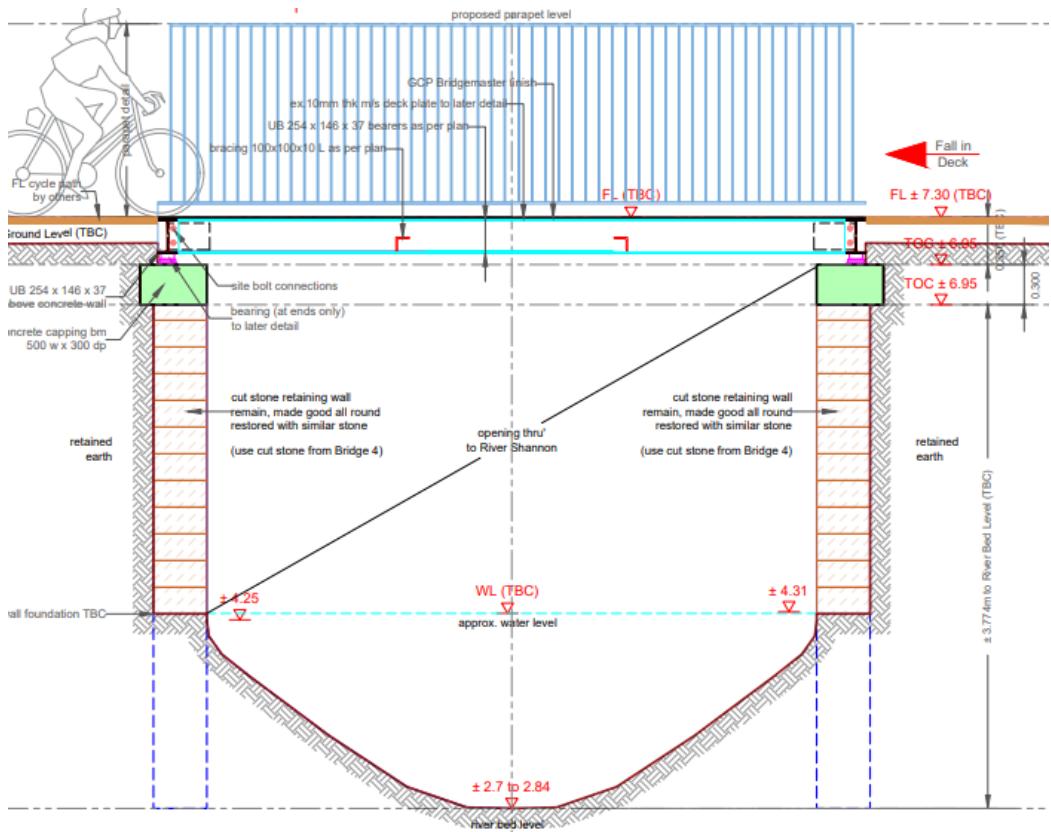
Proposed deck replacement for Bridge 3 with new concrete plinths on existing stone abutments
